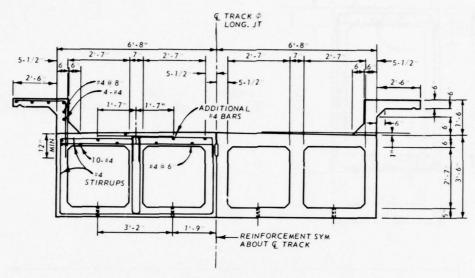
Cross section for 45-ft girder length (from Reference 31)
